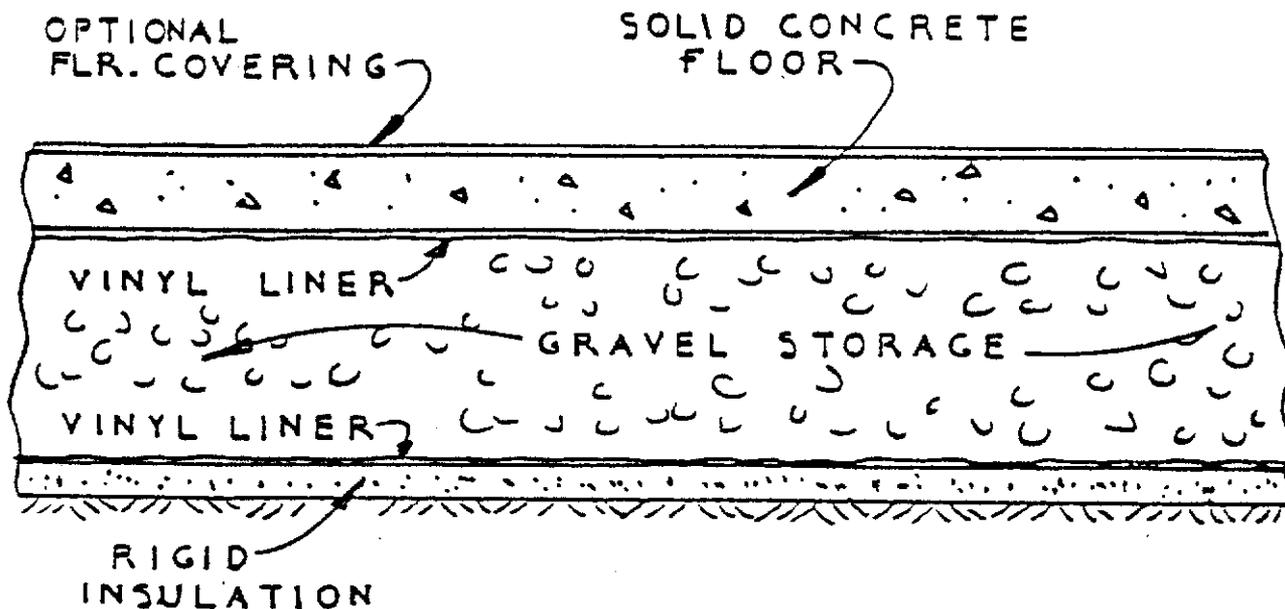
VIEW OF FLOOR CROSS SECTION IN INSTRUMENT SHED
